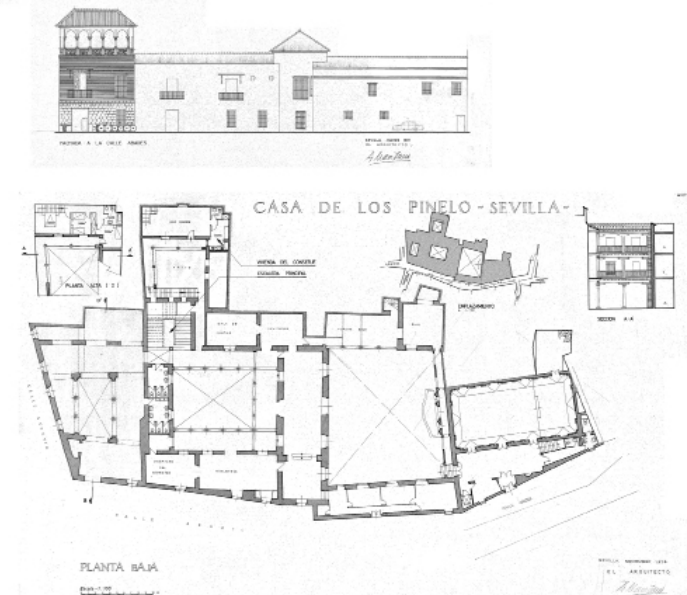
Main facade and ground floor of the Pinelo palace plus the adjacent plot, 1978. Source: Rafael Manzano archive (RMM).
